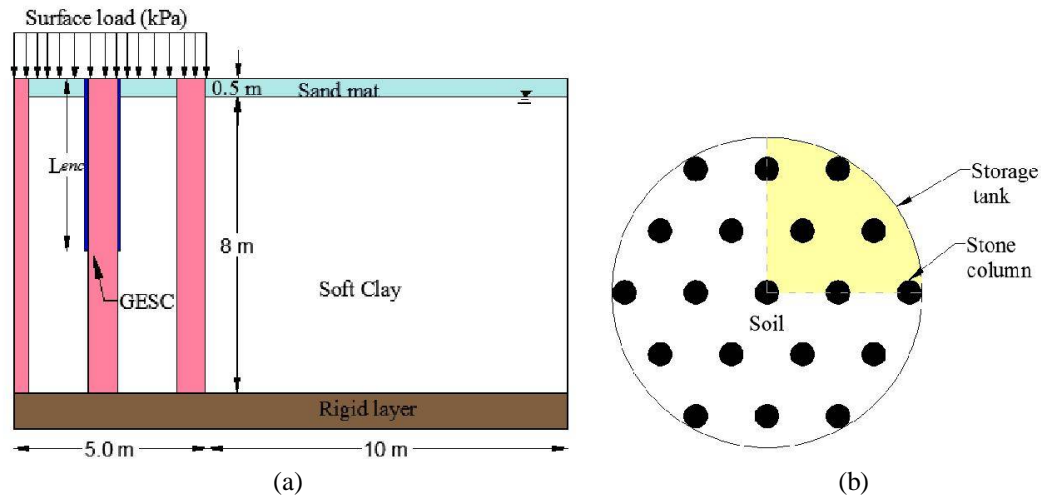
Numerical modelling. (a) Cross section of stone columns under circular tank. (b) Plan of circular tank.
